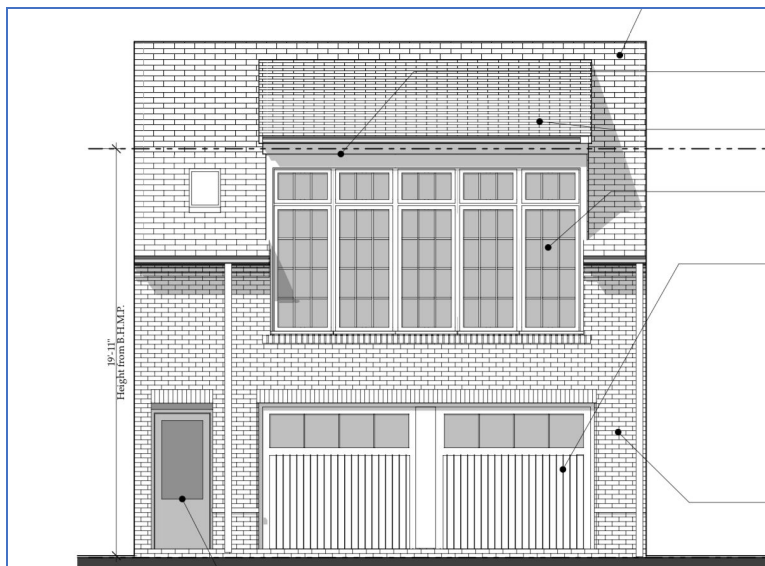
1258 Florida Ave Carriage House (Construction Pending 2020)
